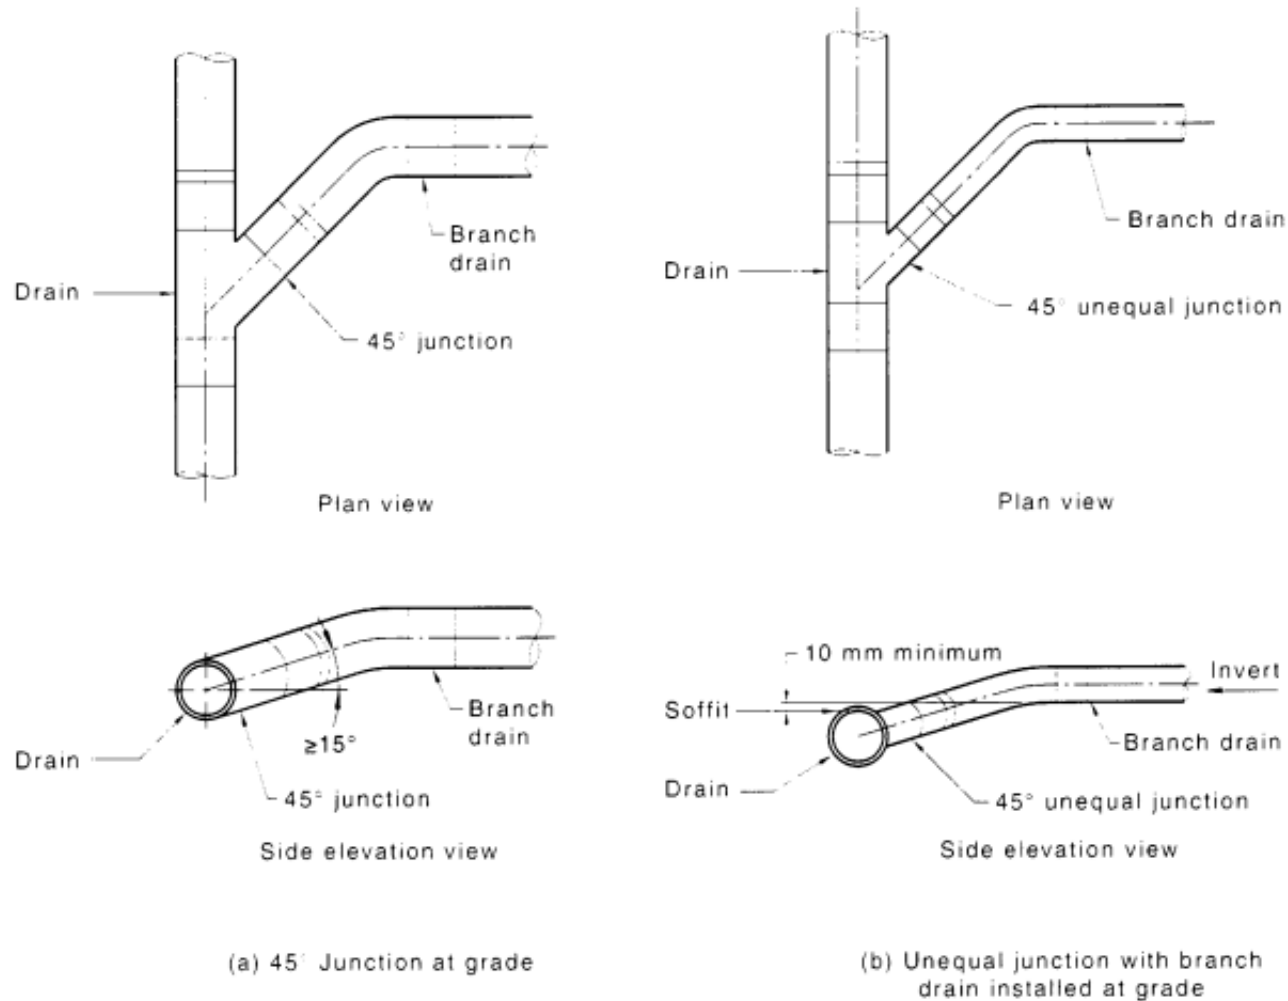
Typical arrangement for a graded branch drain entering another drain
